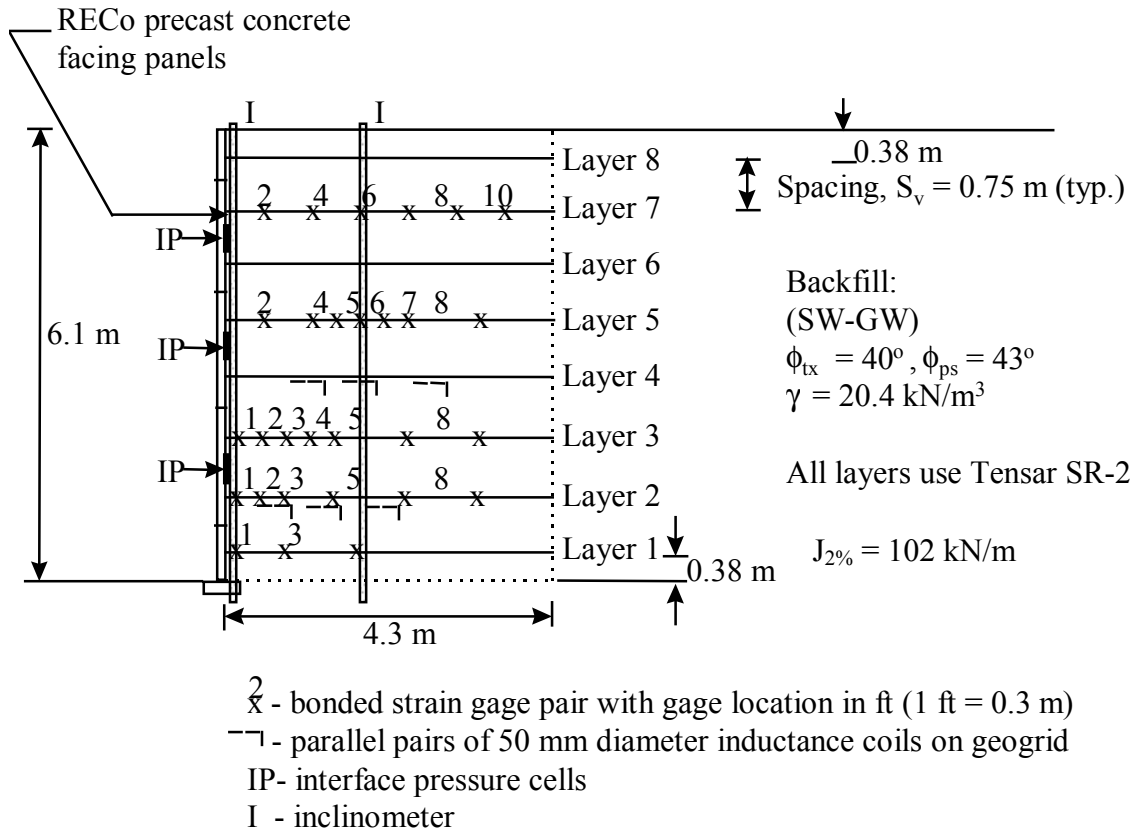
Wall geometry and instrumentation plan for Wall 2 (After Lee, Holtz, and Allen, 1999).
